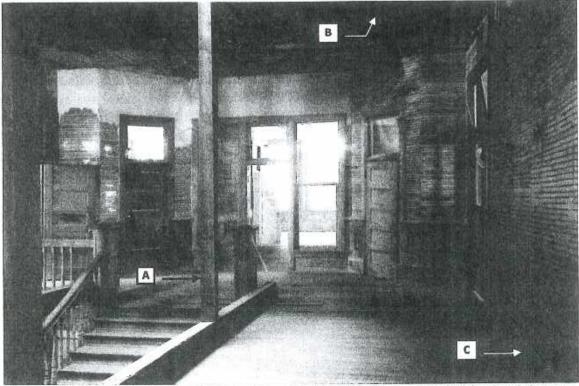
Level 3 Stair Hall view east. (A) Shoring pier and beam per 2010 structural retrofit, (B) Lath and plaster are missing from ceiling, (C) Wainscot paneling separating from wall.
